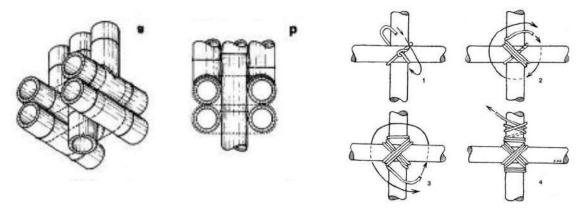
52Horizontal and Vertical Lashing joint in Bamboo
